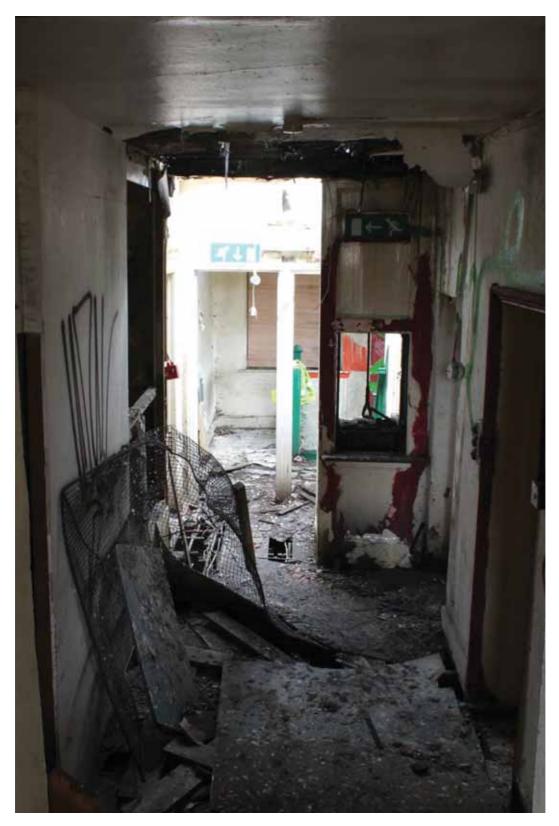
First floor corridor of the west (Phase 1) part of the building, showing dumb waiter, looking west
